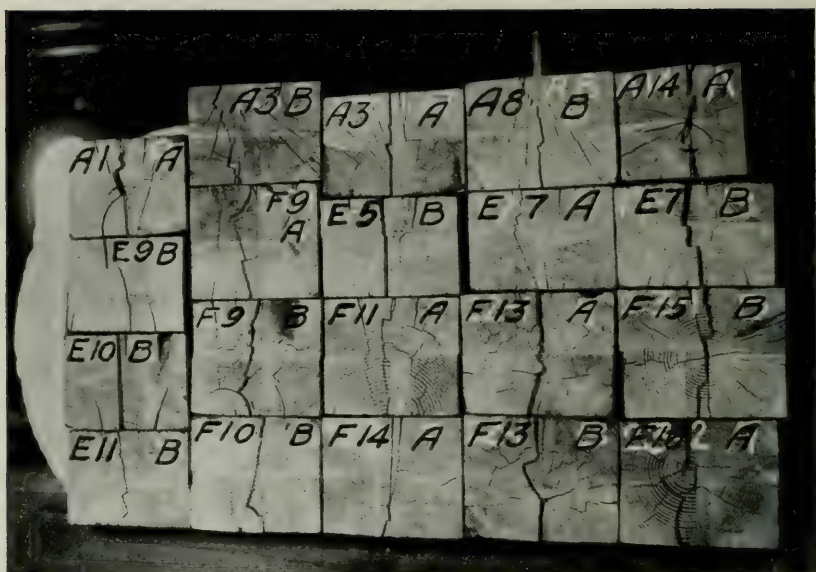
VIEWS OF SHEAR BLOCKS AFTER FAILURE.
